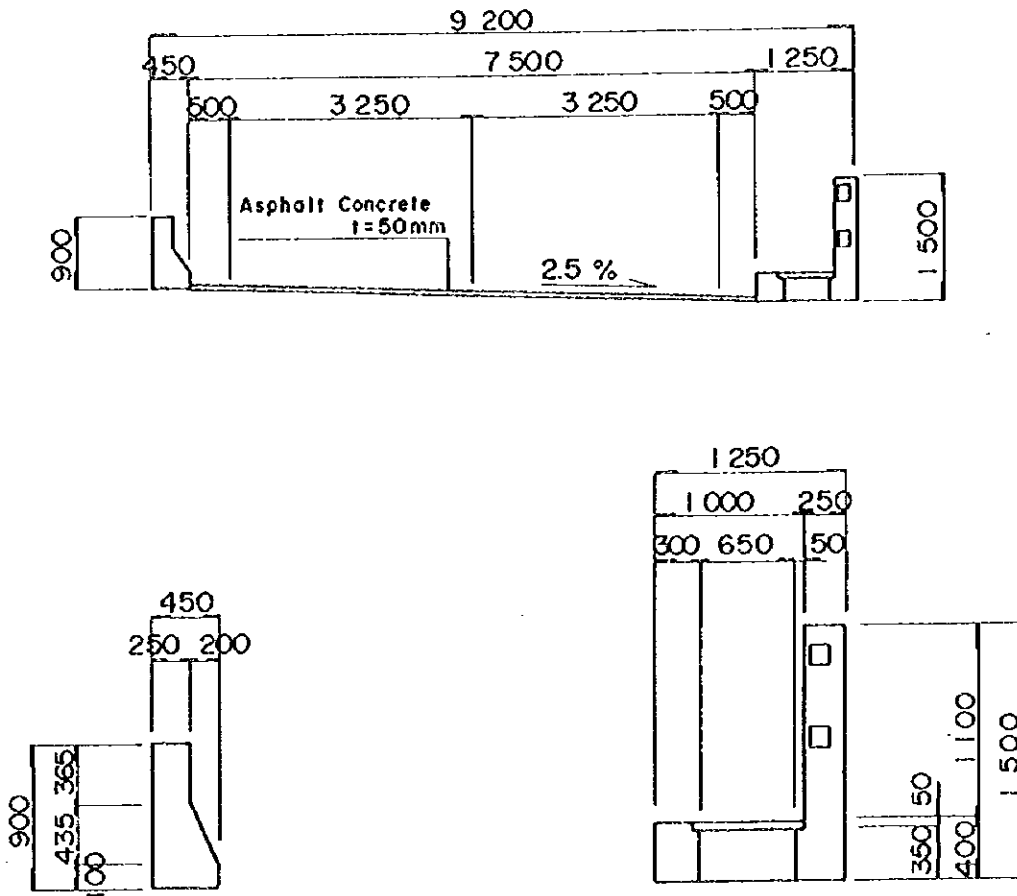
Width components and sectional dimensions of parapet wall and hand rail
